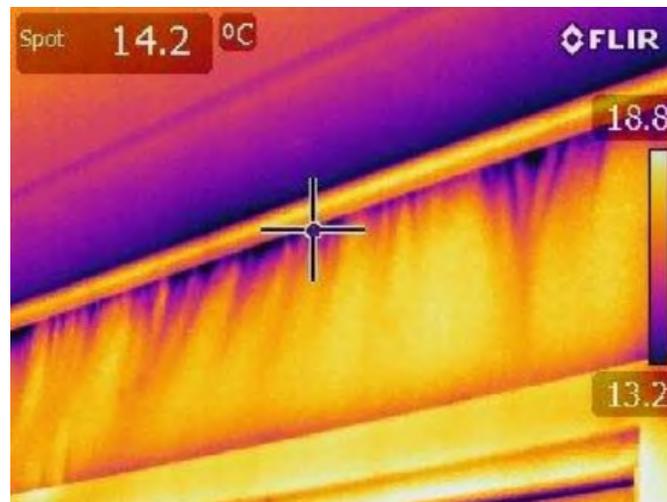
Thermographic photo of joint at facade/ceiling at Renovated Apartment 1 Entrance
